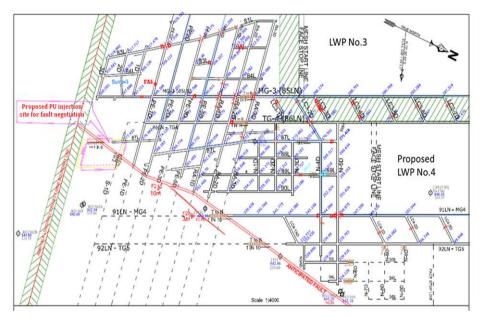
Plan showing the proposed PU Injection site for negotiating 10m down throw fault in No.1 seam
